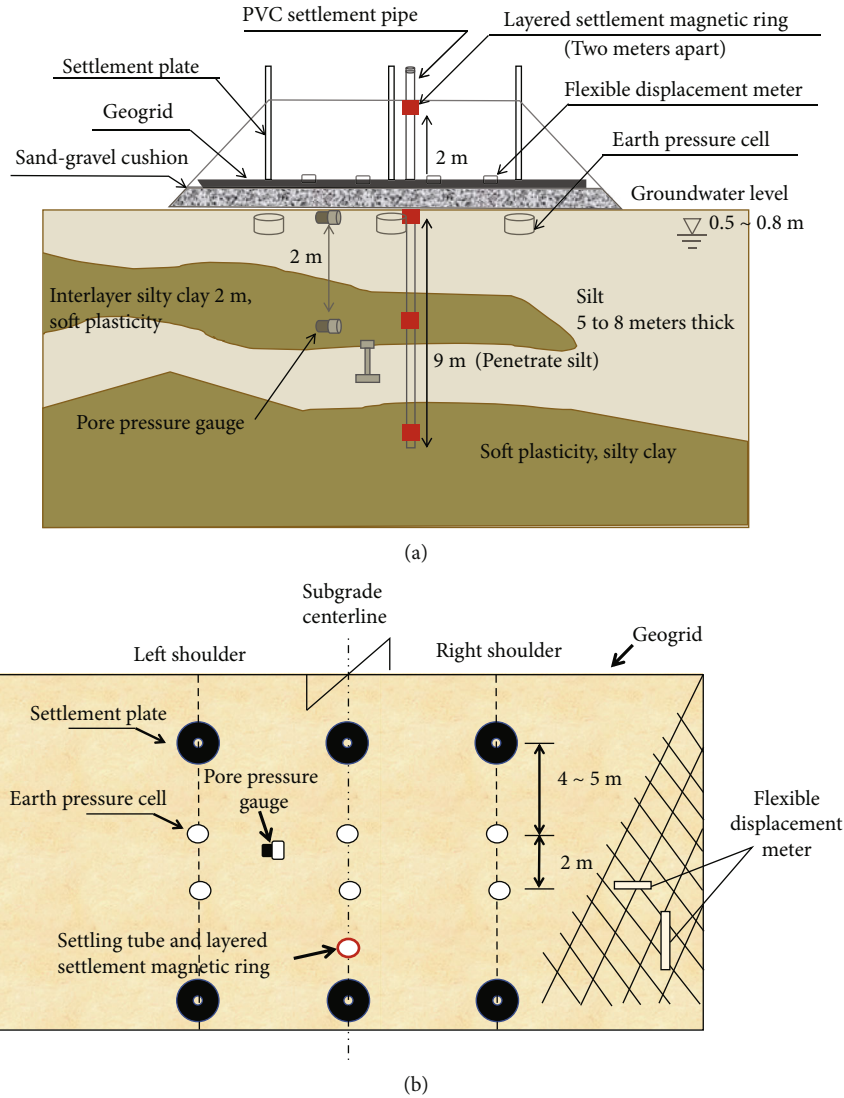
Layout scheme of sensors: (a) layout of the subgrade section and (b) layout of the subgrade platform.
